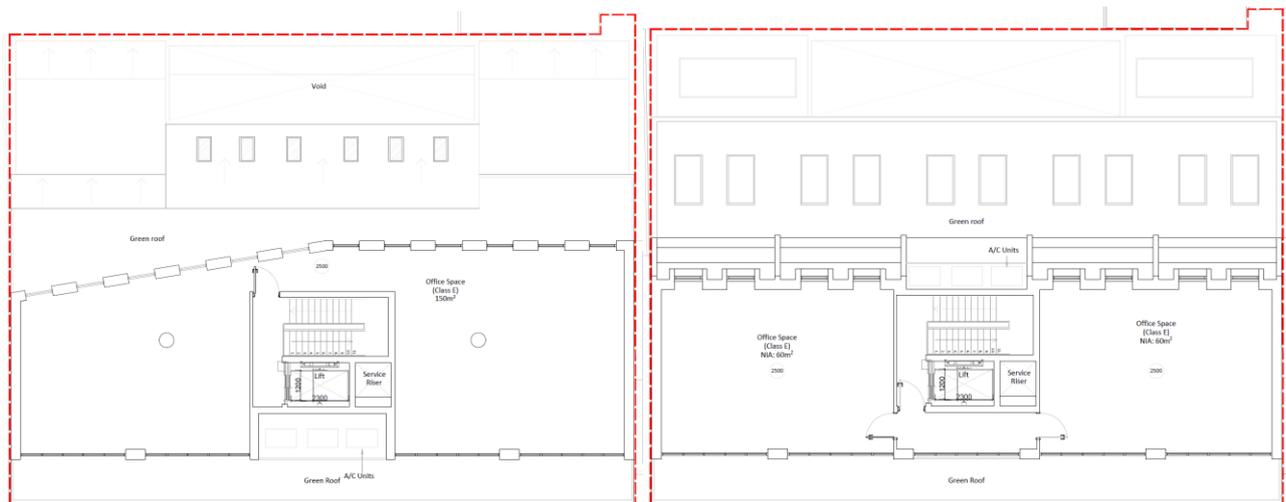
Third floor of refused scheme (left) and current revised application (right)
